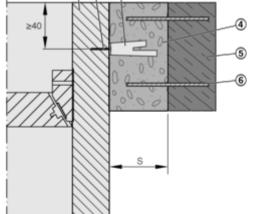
EK-JZ mortar-based installation with wall fixing tabs
